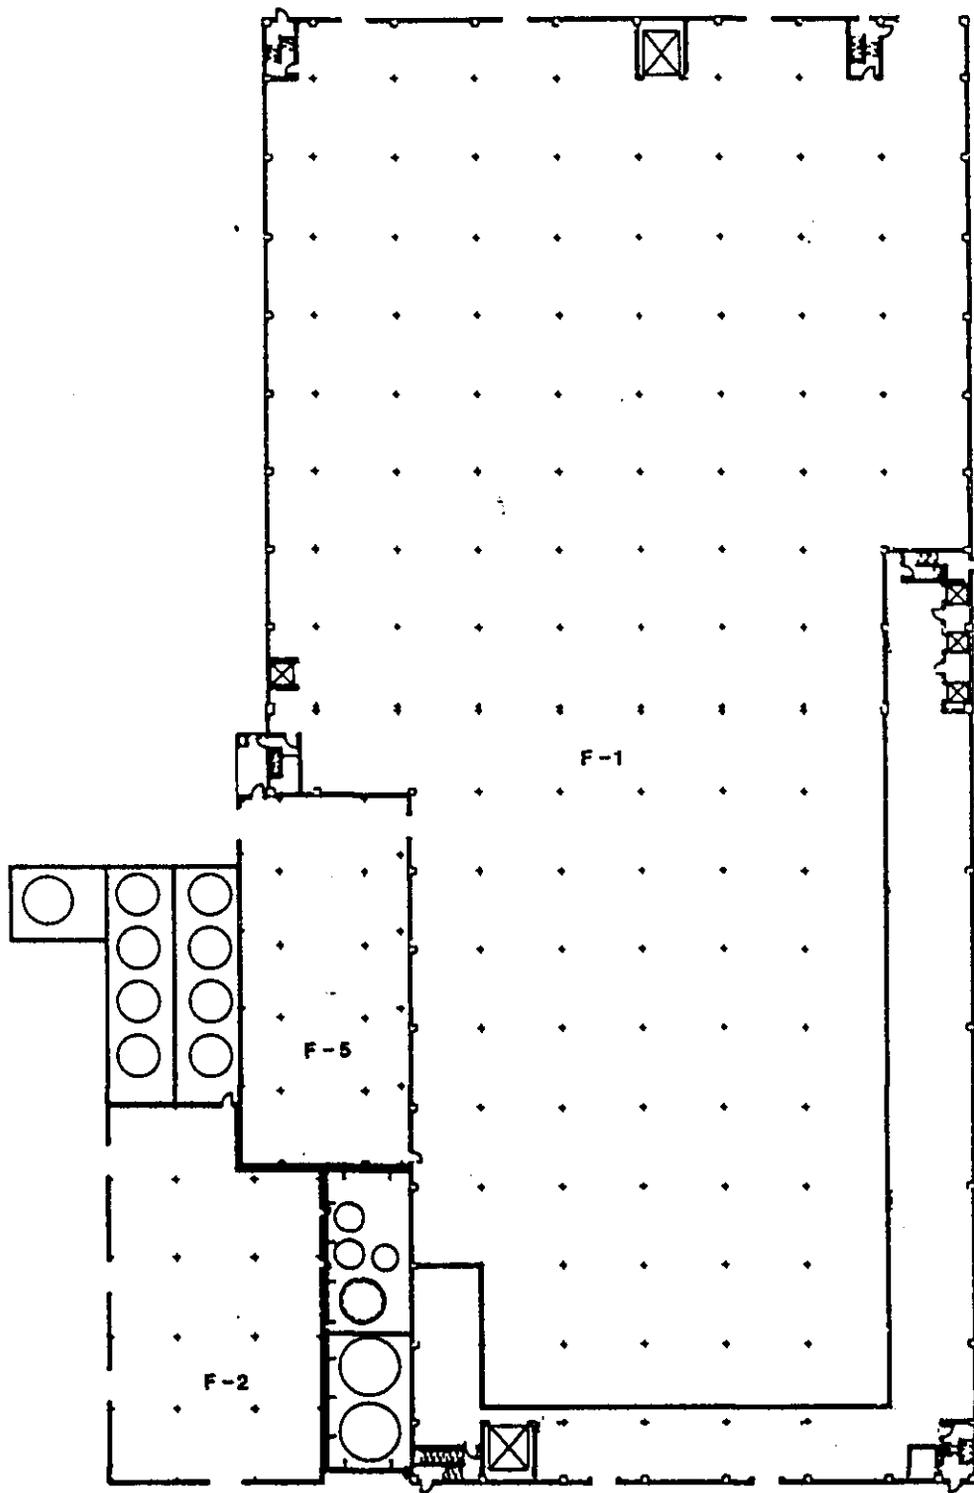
F-BLOCK PLAN AT F-1 MEZZANINE LEVEL
